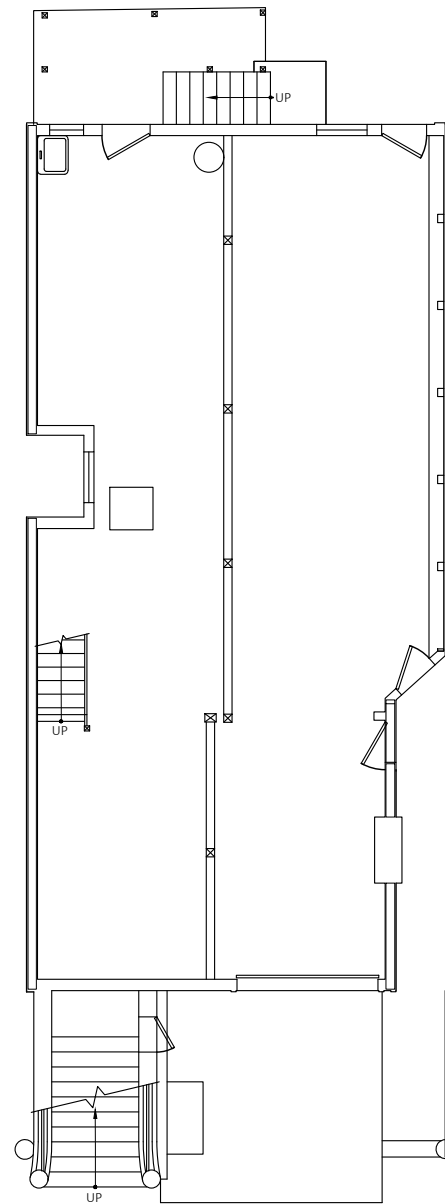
NEW WALLS CONVERTED DOUBLE-PARLOR TO BEDROOM ON ENTRY LEVEL
